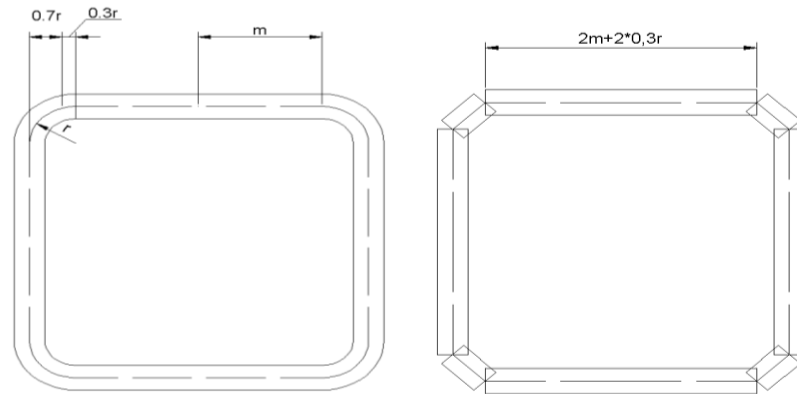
Real cross-section and section studied, ABAQUS.
